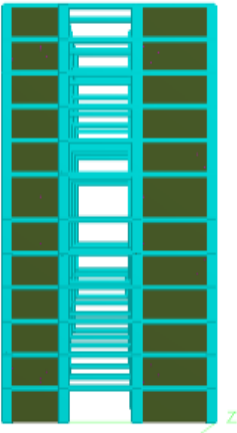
Front view of Hostel no. 05 with Shear Walls at corner
